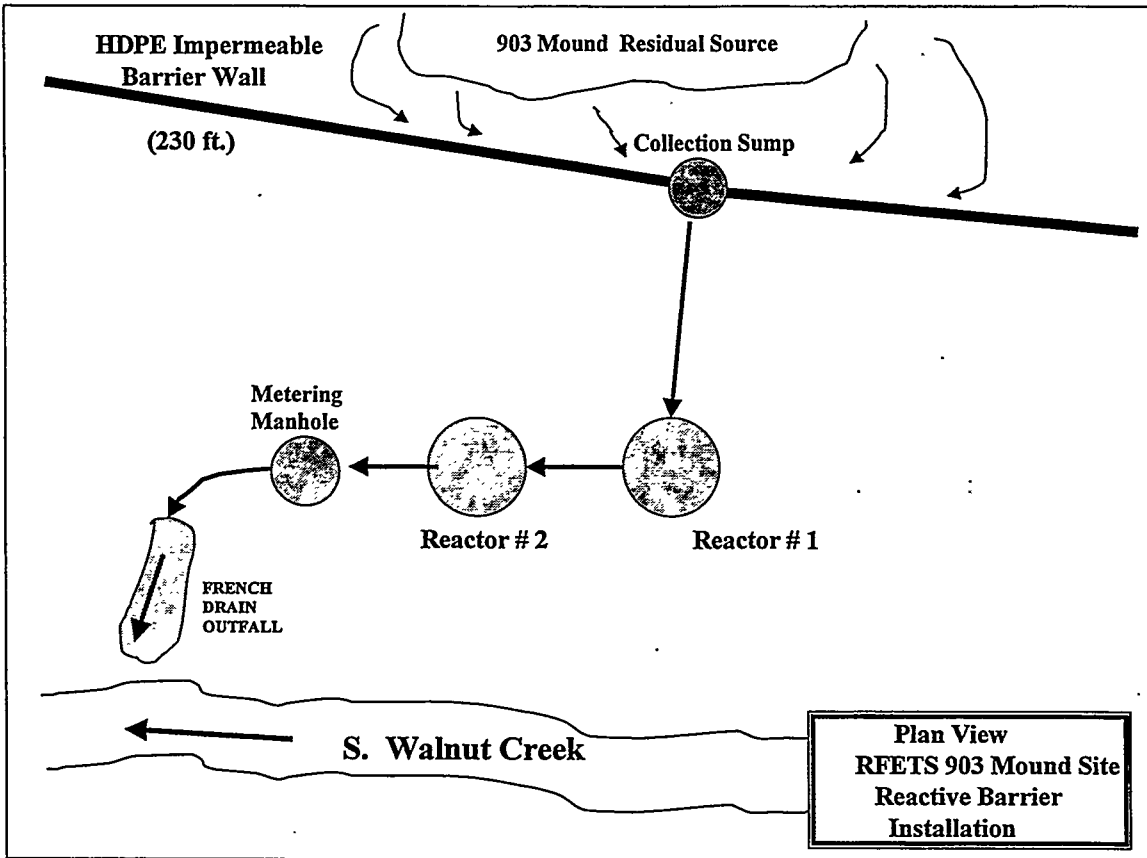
Schematic Plan View of 903 Mound Site Reactive Barrier Layout.
